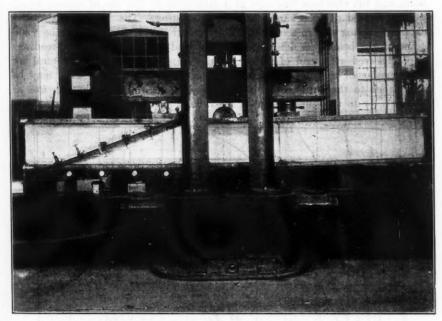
WELDED BEAM, WB-1, SHOWING WEB FAILURE DUE TO SHEAR
